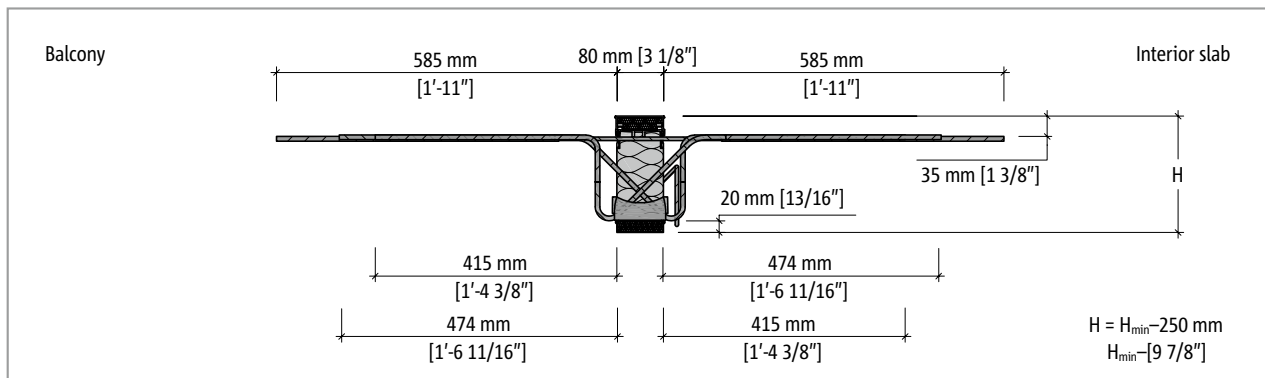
Schöck Isokorb® T Type CK-M4-VV1 to M5-VV1: Product cross-section
